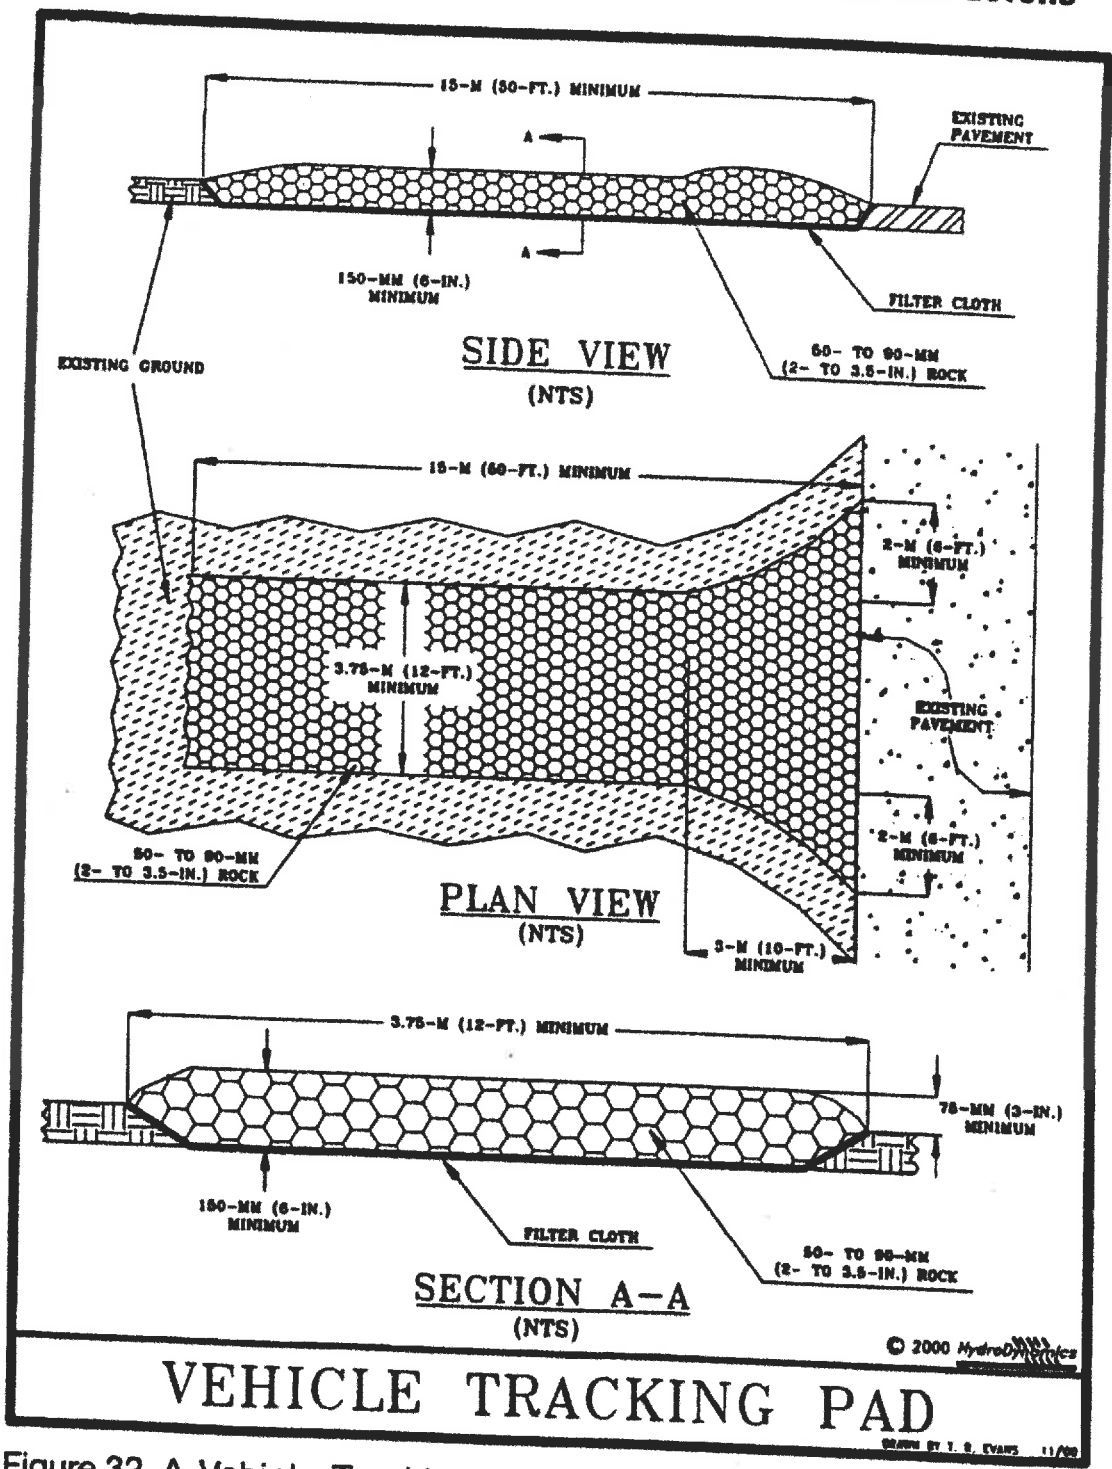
A Vehicle Tracking Pad Installed at a Construction-Site Entrance
